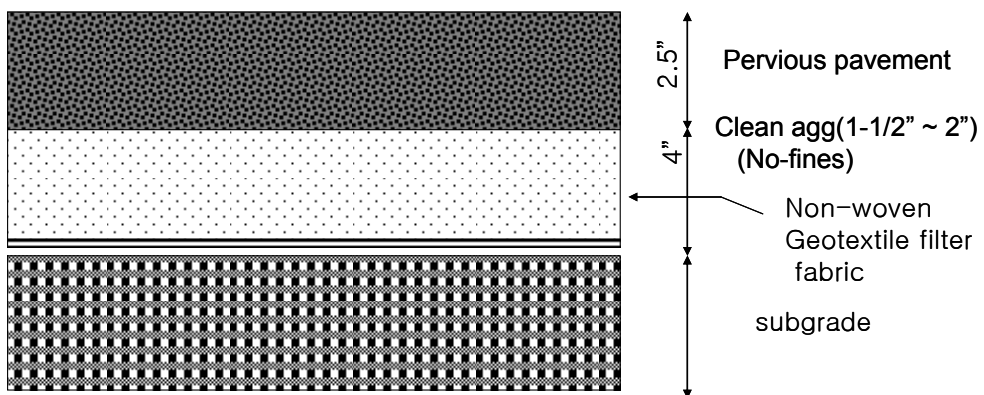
Pervious concrete pavement design for sidewalk, cart path, hike, and bike trails, after (www.stonecreekmaterials.com).
